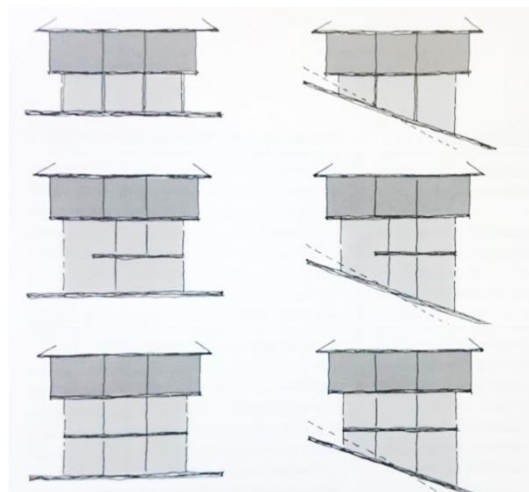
Site intervention, floors and main floor relationship (Küçükerman, 2007)
